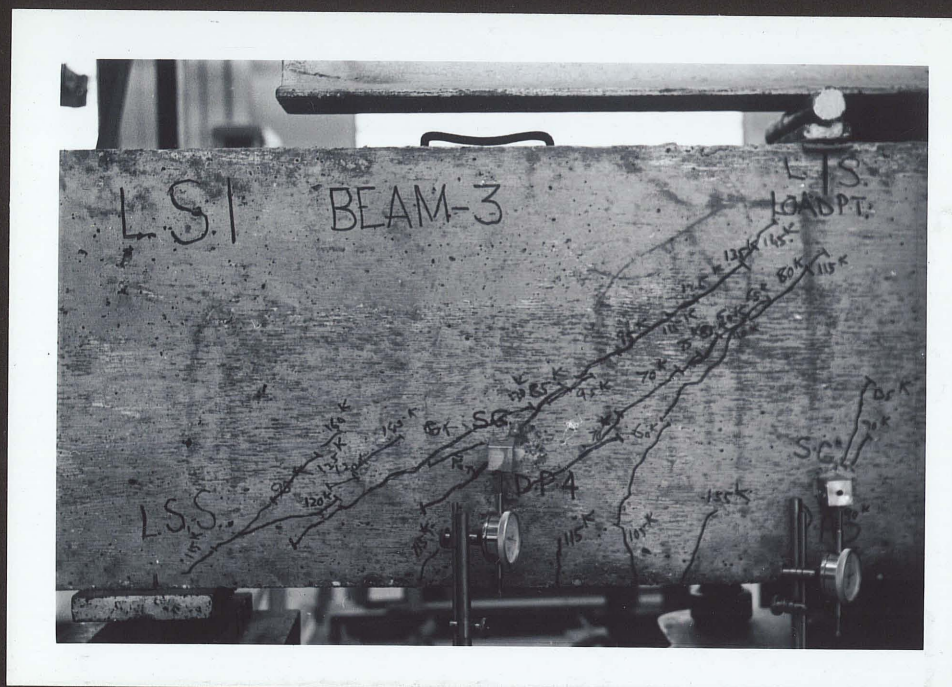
Beam 3: Detail & Crack Pattern (side L.S.1)
